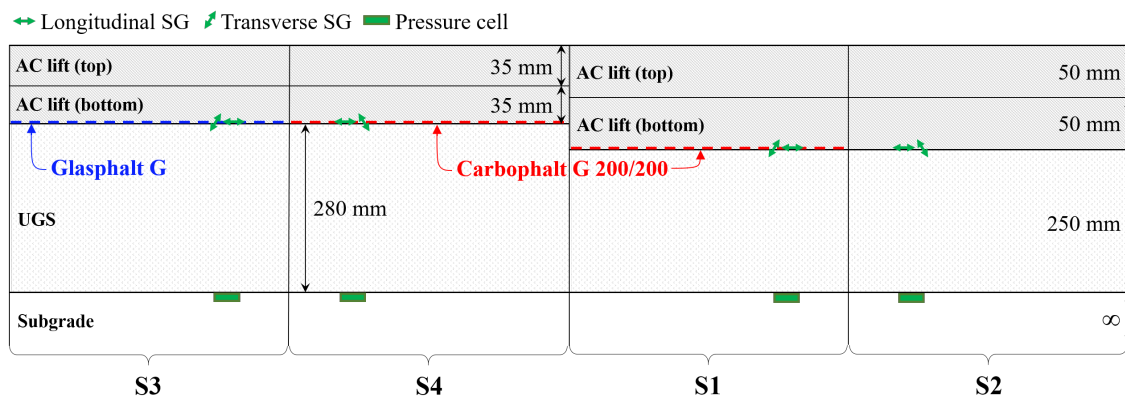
Cross-sectional view of the four instrumented test sections at UTA.
